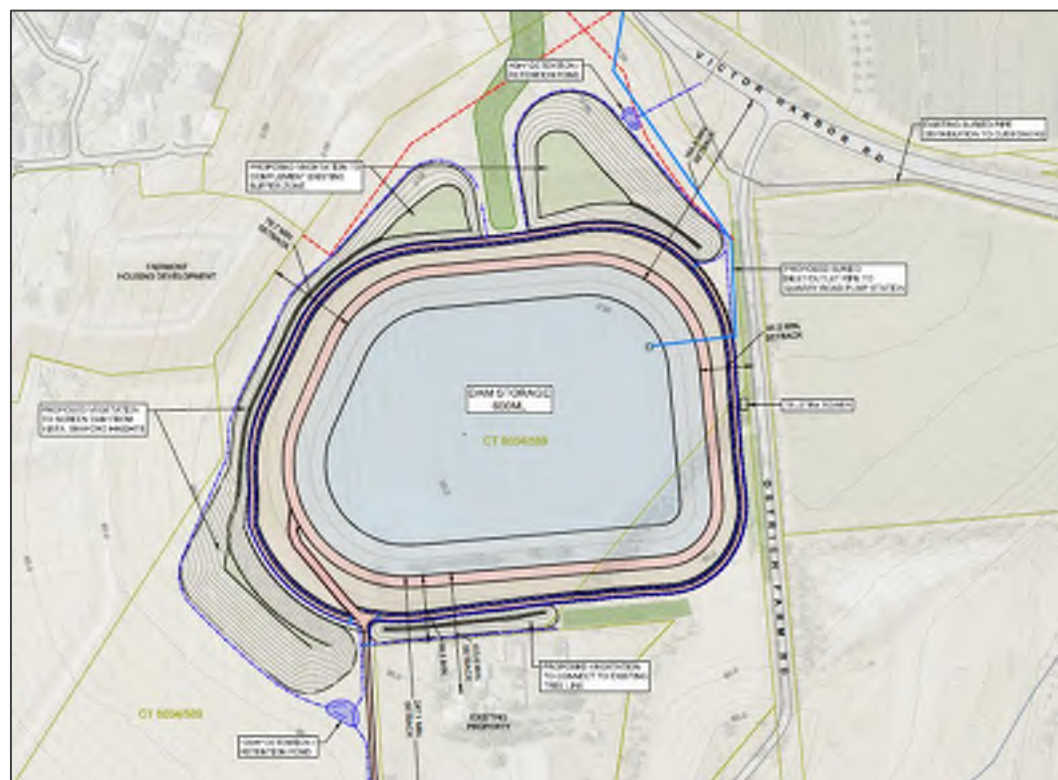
SRWRA treated water storage dam site layout (see attachment for full plan)
